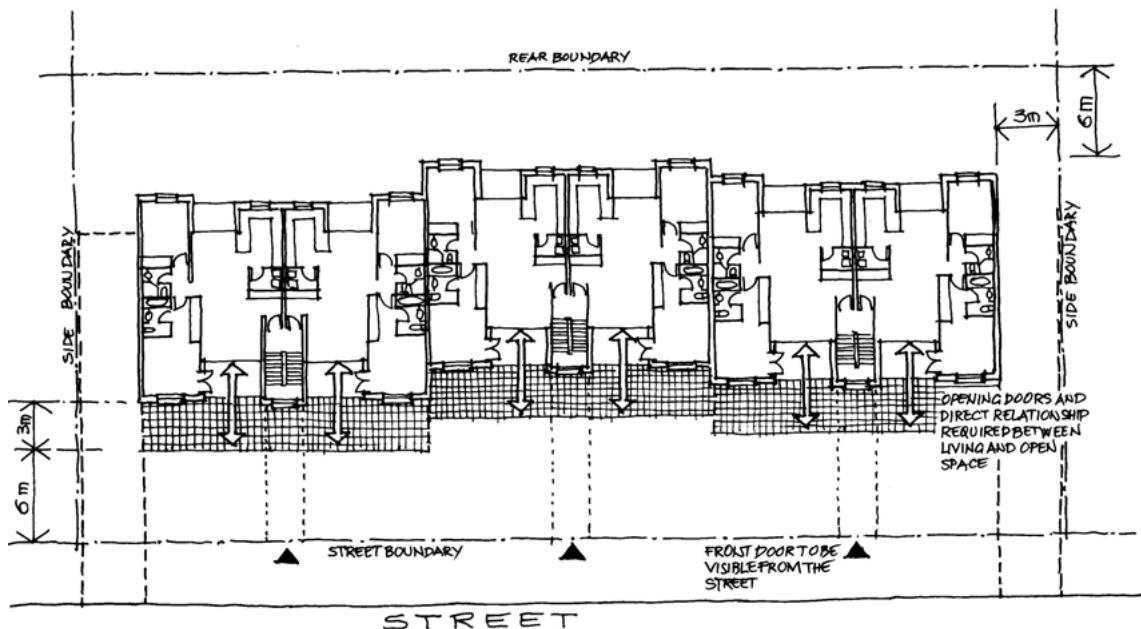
Plan - residential flat building development.
